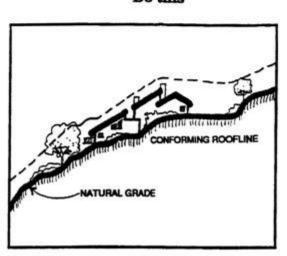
BUILDING HEIGHT/ROOF SLOPE
